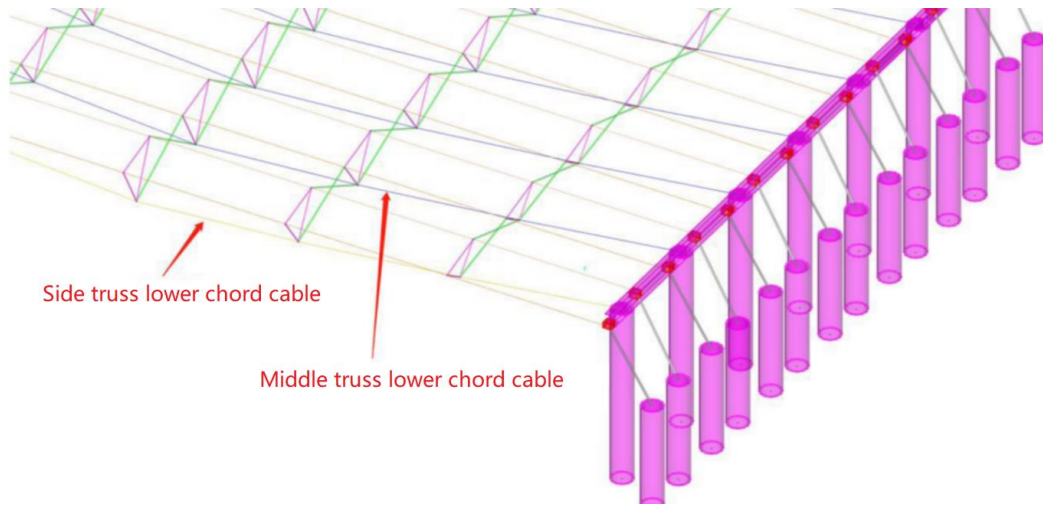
Layout diagram of double layer cable truss structure for photovoltaic power generation
